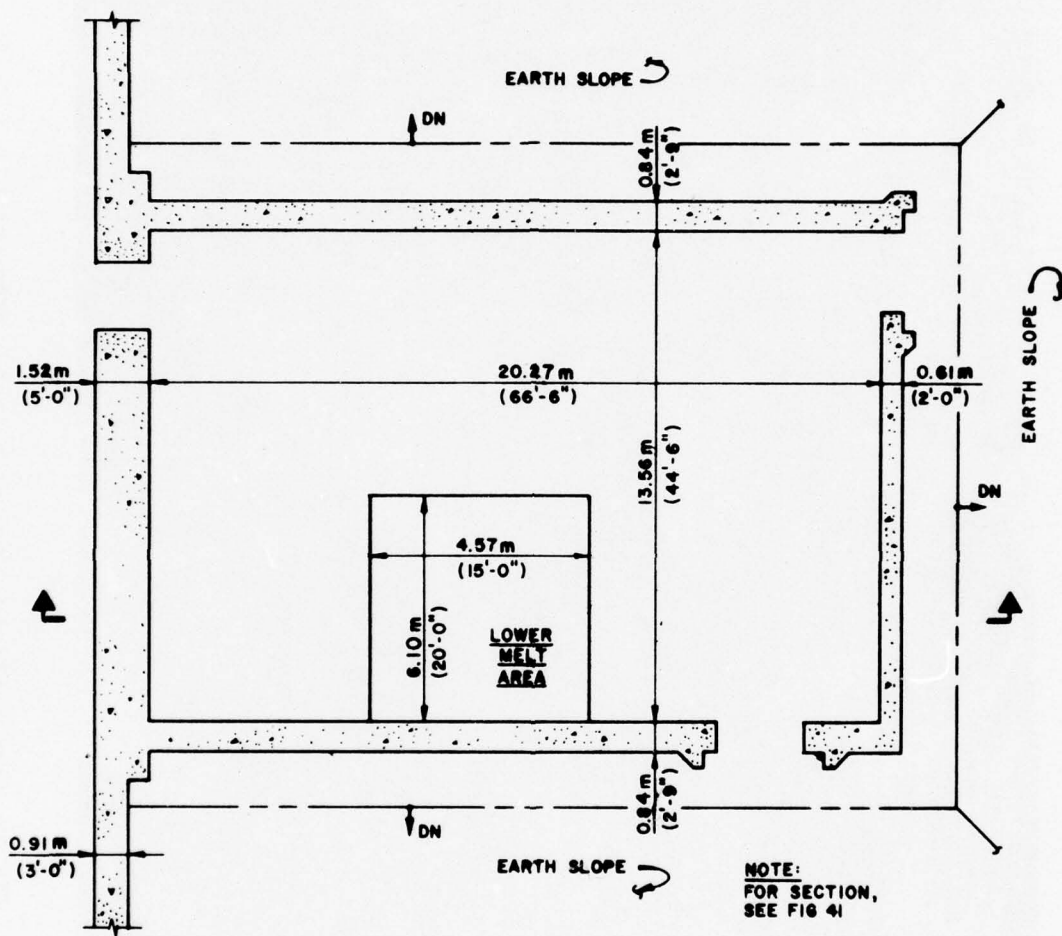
Floor plan - Melt/Pour Building, LSAAP
